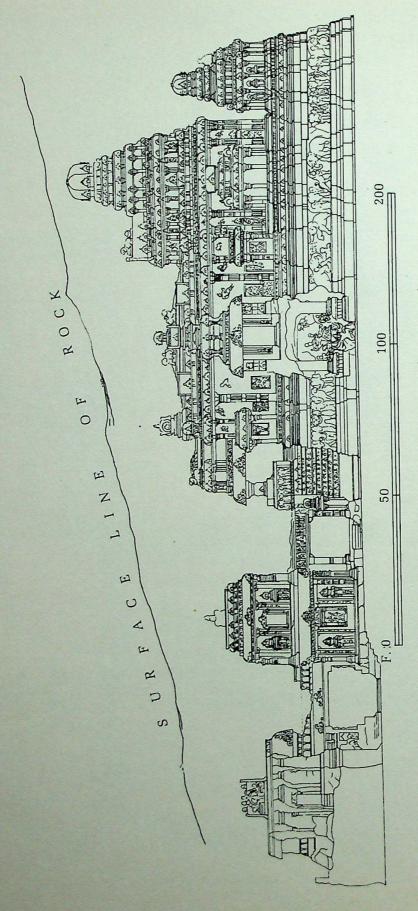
Ēllōrā. Kailāsa temple, elevation. (After Burgess.)
